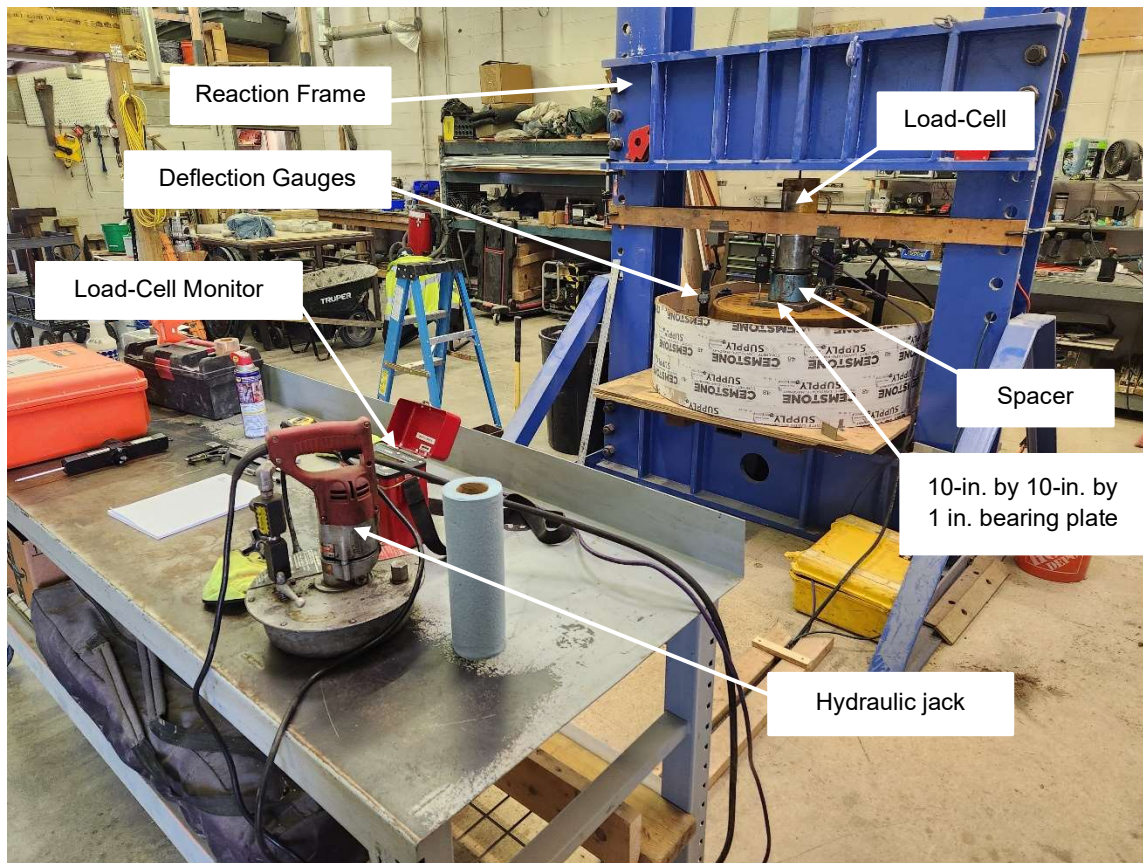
Riser ring assembly surrounded by load frame, bearing plate, load cell, spacer, deflection gauges, load-cell monitor, and hydraulic jack
